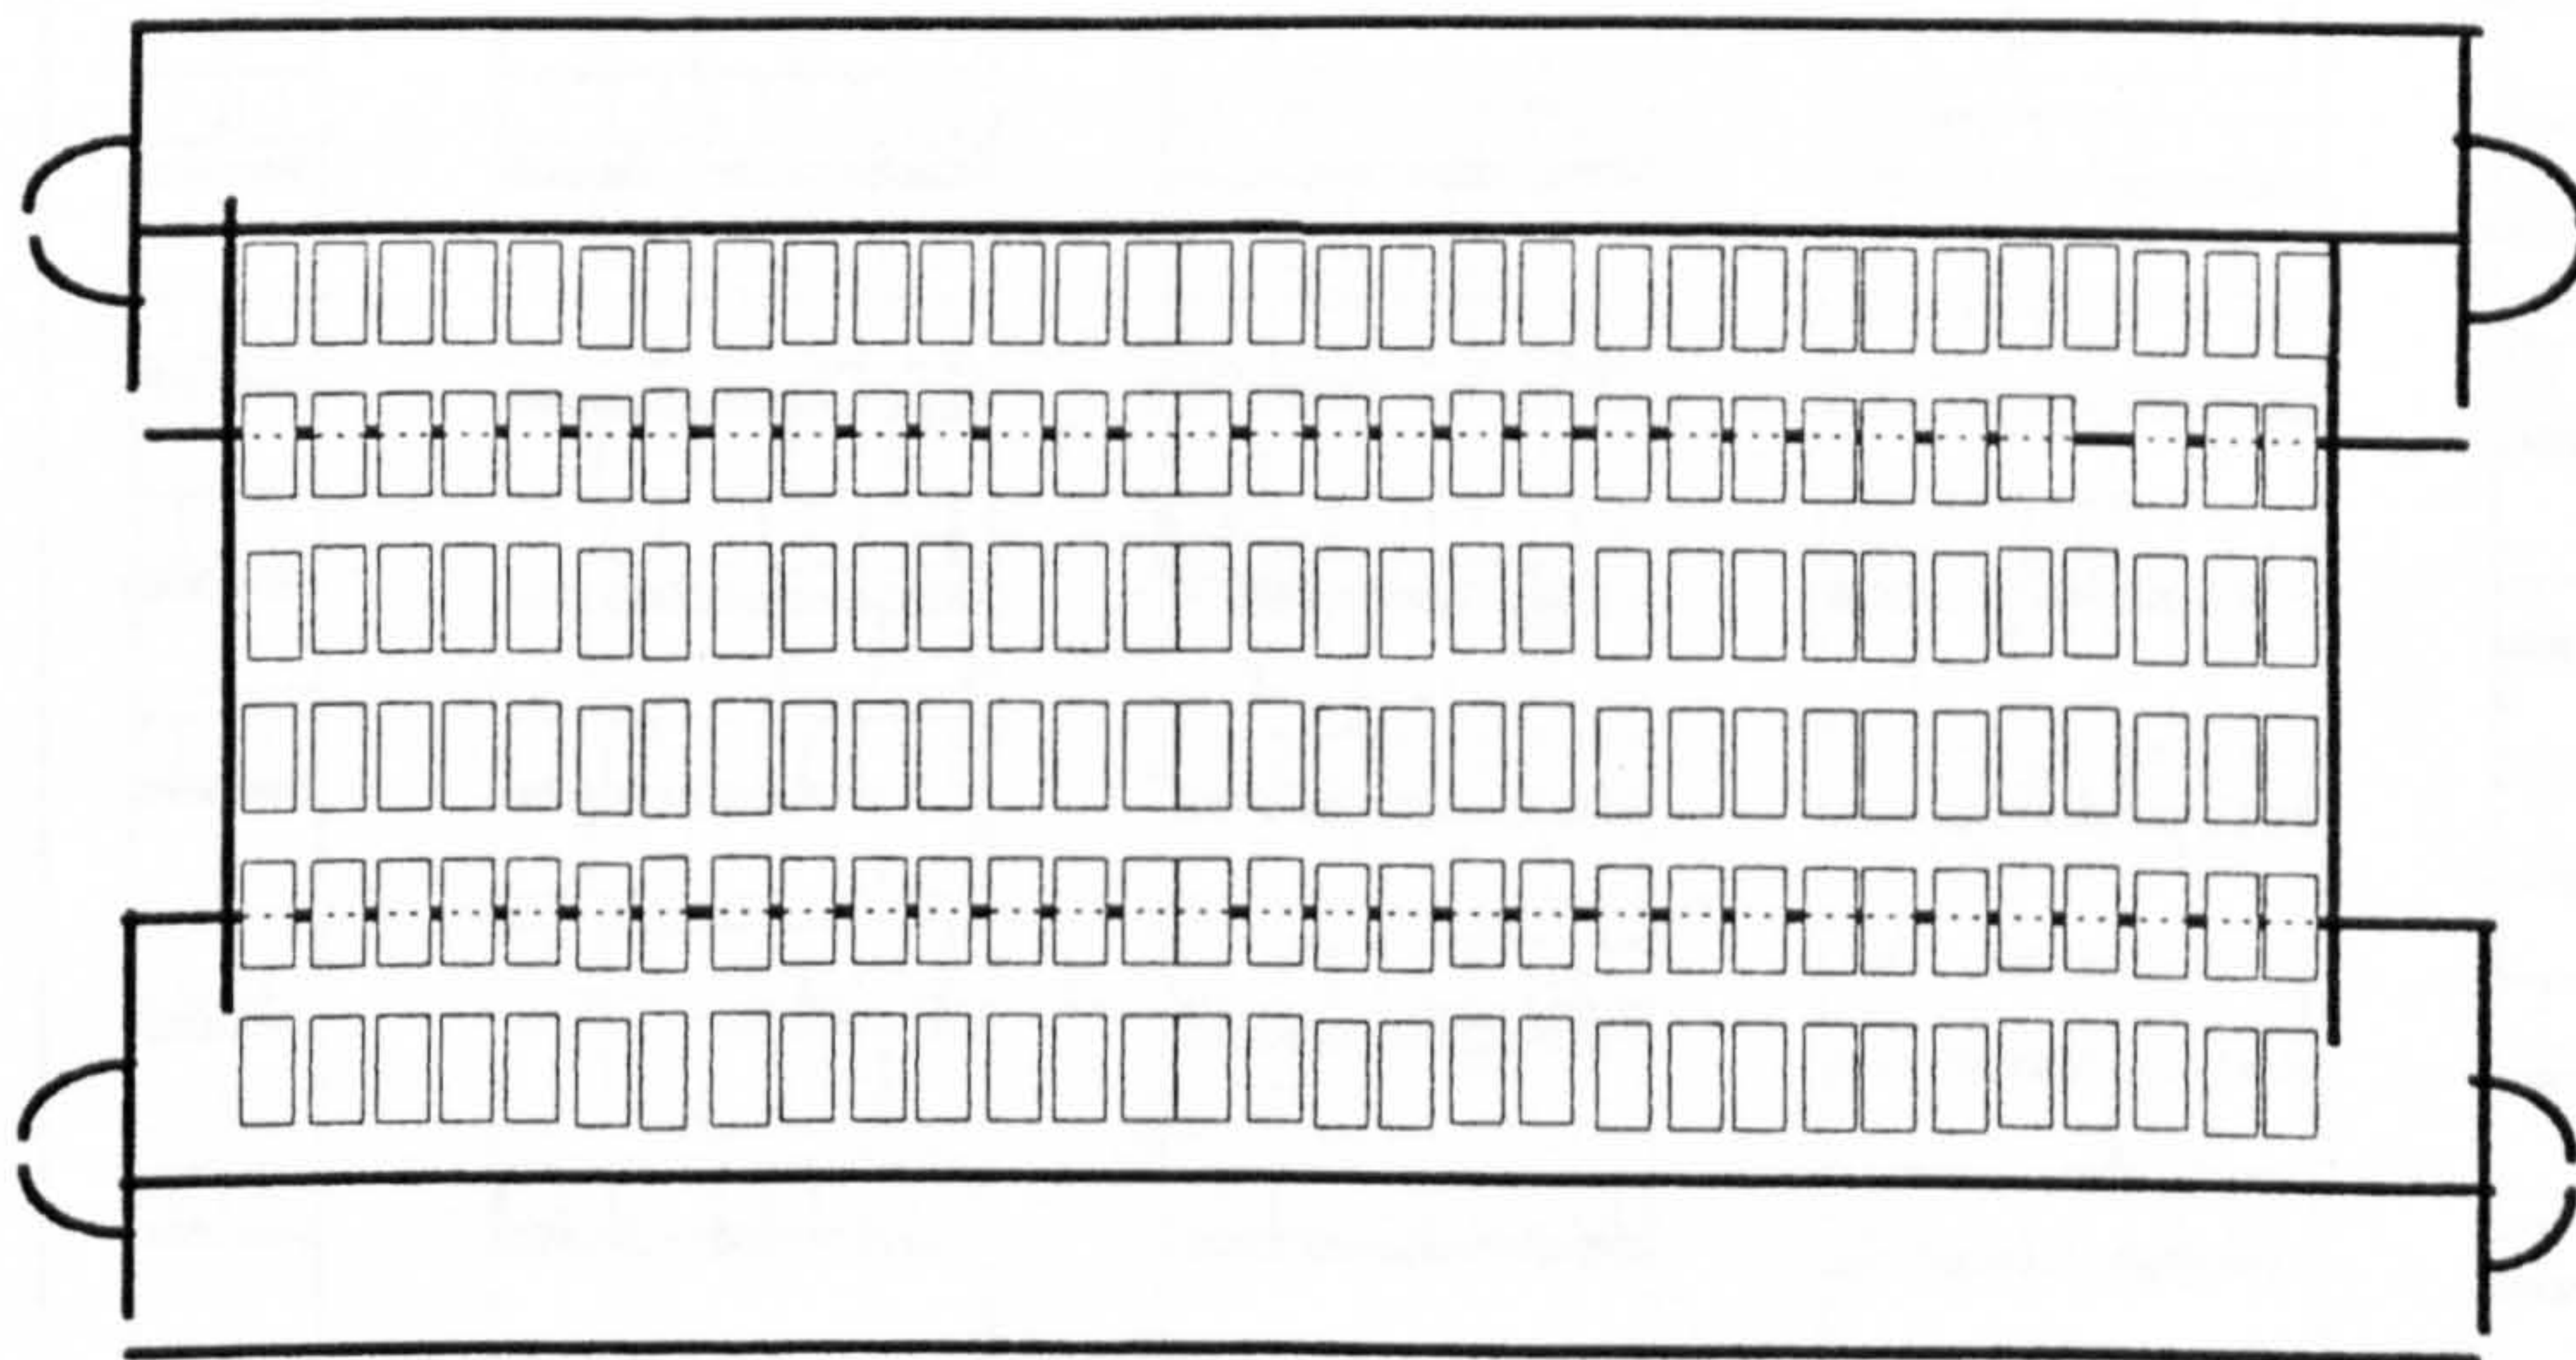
Roof View of Passively Ventilated Building showing the position of the modules
